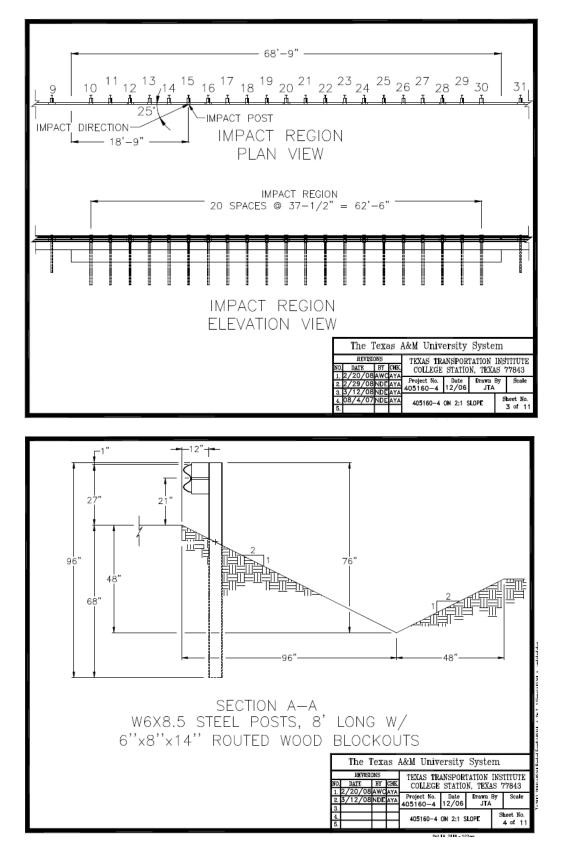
Barrier Installation, Test No. 405160-4-1 [13]
